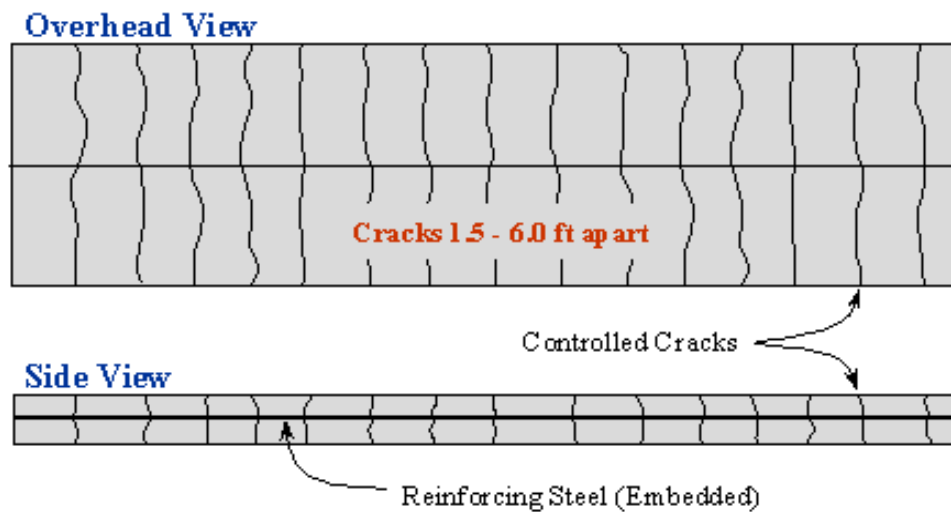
Continuously Reinforced Concrete Pavement (ACPA 2009)
